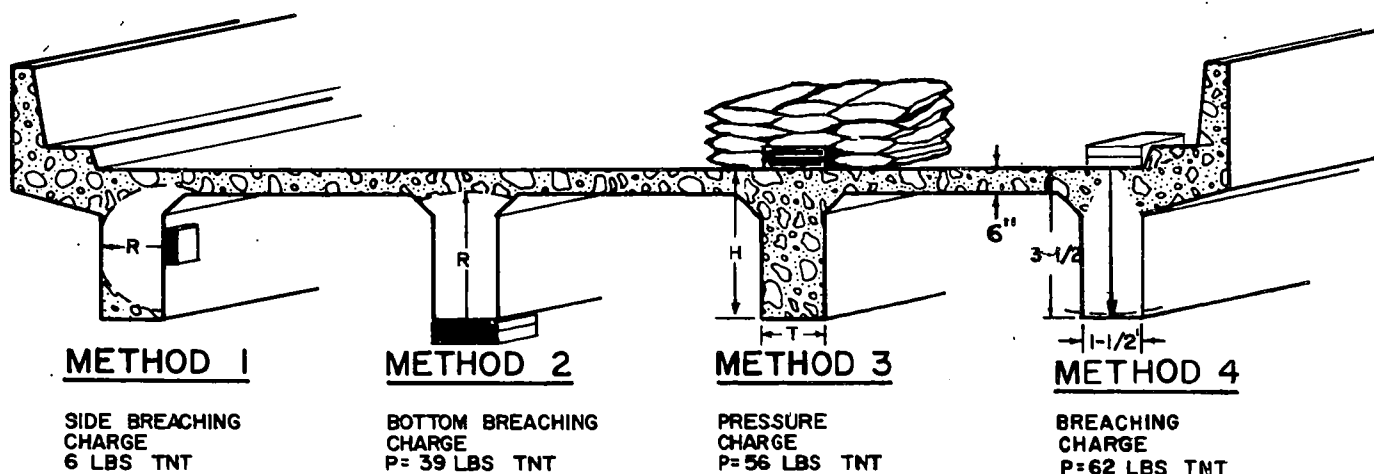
Demolition of reinforced concrete T-beam superstructures.
